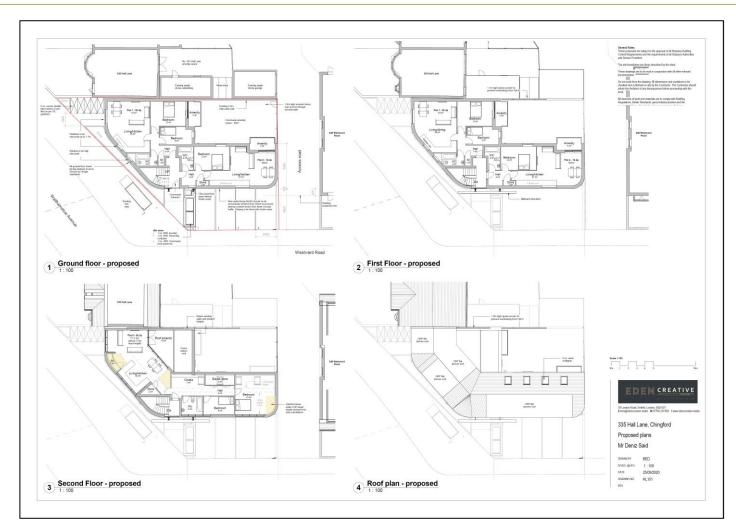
Proposed site layout plan (Reproduced by courtesy of Eden Creative)
